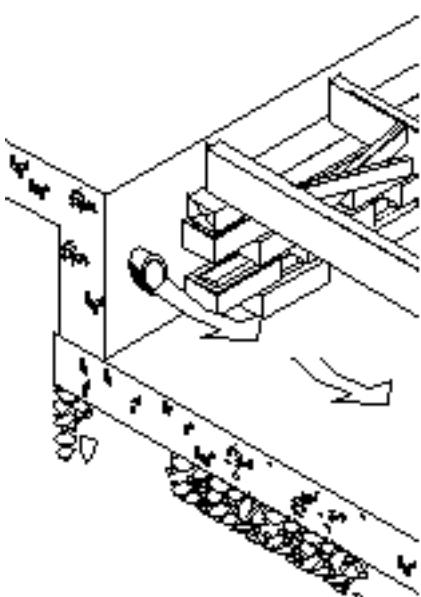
Vents inserted to provide cross-ventilation in a part solid, part suspended ground floor
